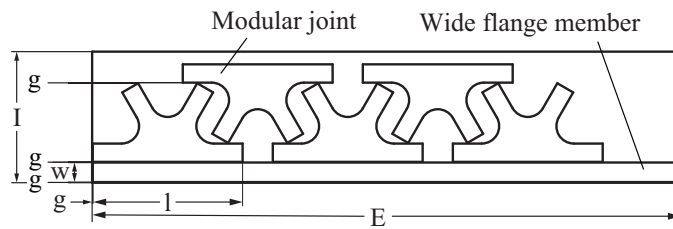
Elevation view of modular joints and wide flange section stacked vertically within the foot print of an ISO container.
